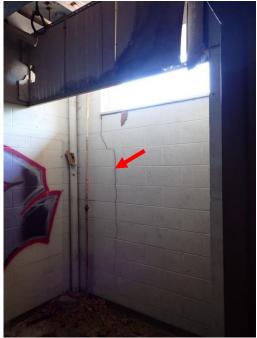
Vertical crack in exterior CMU wall at north facade.
